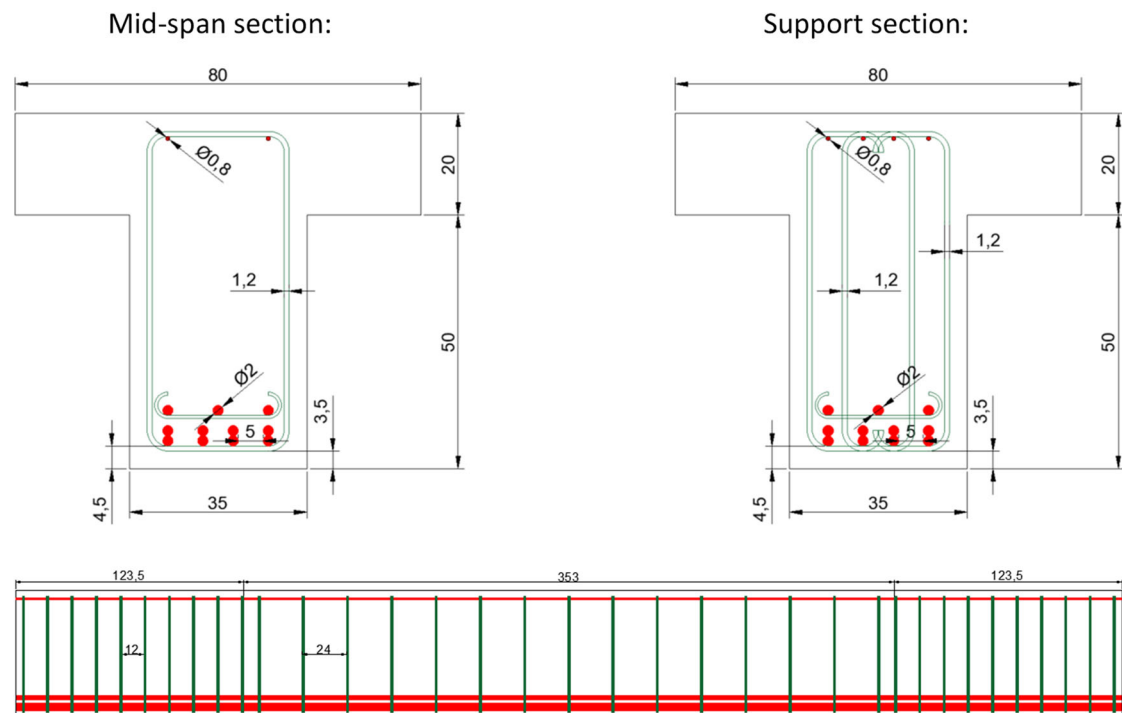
Arrangement of longitudinal and transverse FRP reinforcements (shear force) in the T section of the beam studied at mid-span and on support, extracted from the example of (AFGC, 2021).
